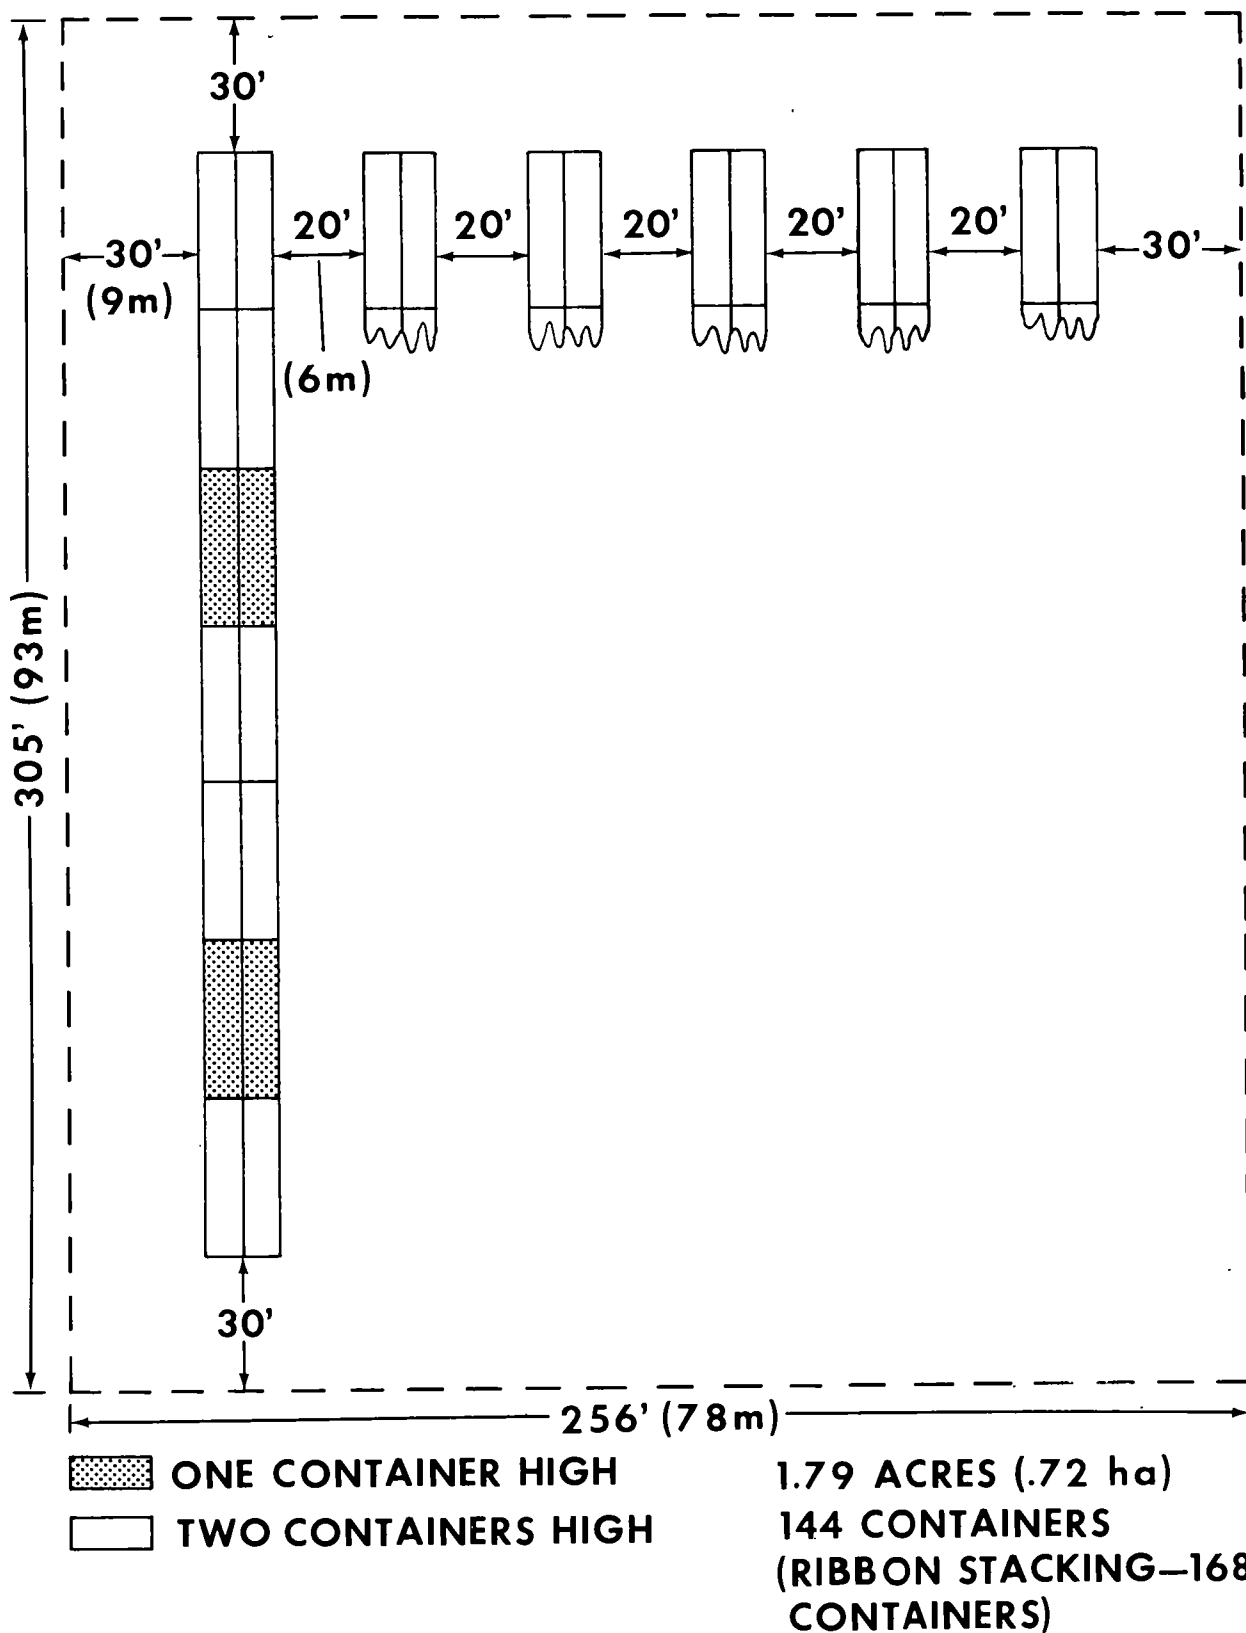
Cluster plan for sideloader turret stacking of 40-foot containers—20-foot working aisle and 60-foot intersecting aisle.
